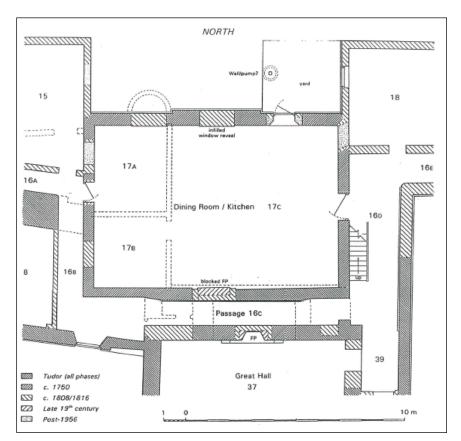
Phase plan of Bishop Sherlock's Dining Room, Ground Floor Level (after Rodwell 1996 fig. 8)
